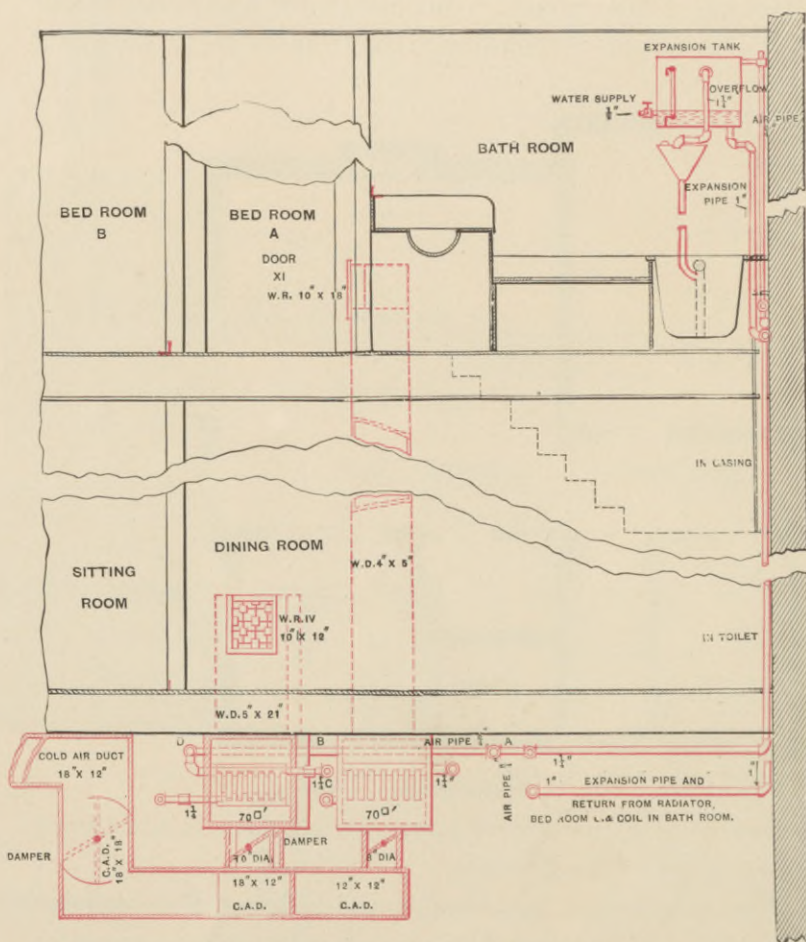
Sectional Elevation Showing Air Ducts and Air Pipes, also Details in Bath Room, with Expansion Tank, etc.
